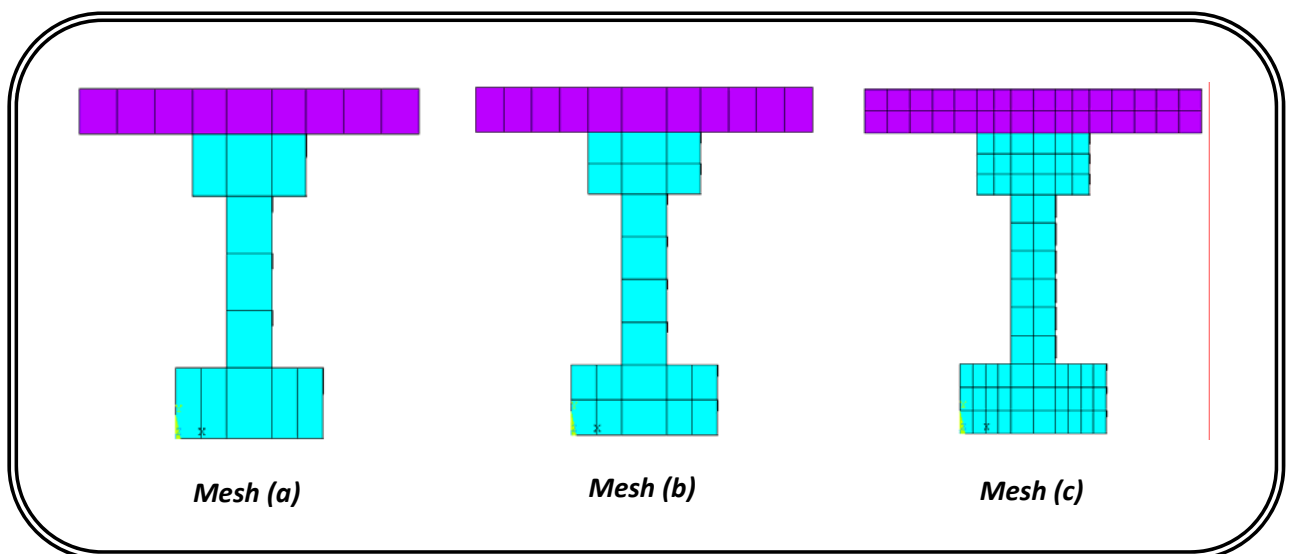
Mesh size details of the prestressed girder type (IV)
